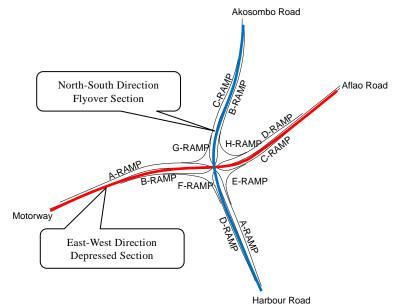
Horizontal Alignment of Main Carriageway and Ramps
